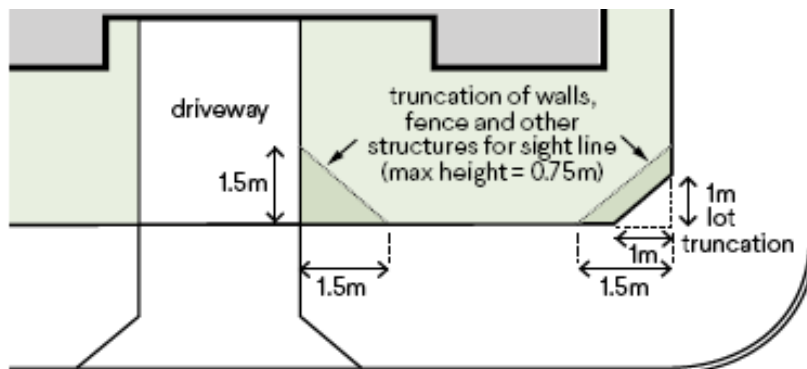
Truncation at driveway and street corner to provide sightlines (Figure 3.8a of SSP7.3)
